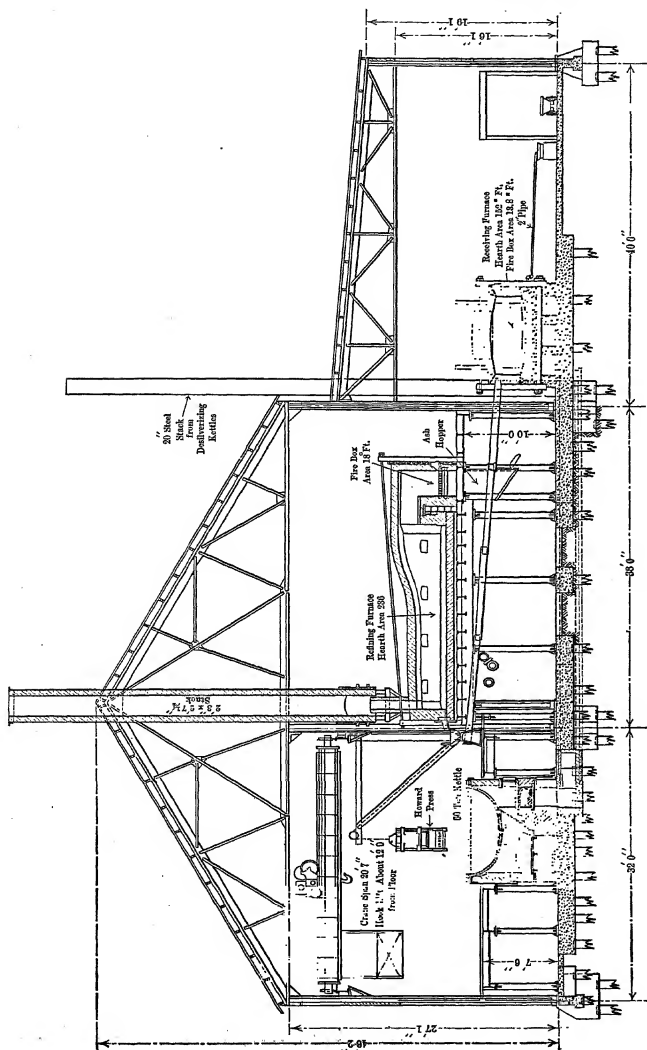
Vertical section Parkes plant, Balbach Smelting &amp; Refining Co., Newark, N. J.
